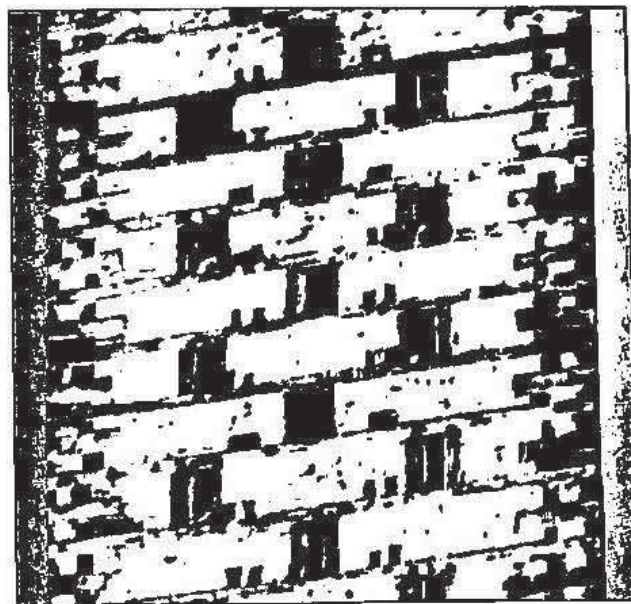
Detail from a section of a *dhhol-maide* wall
